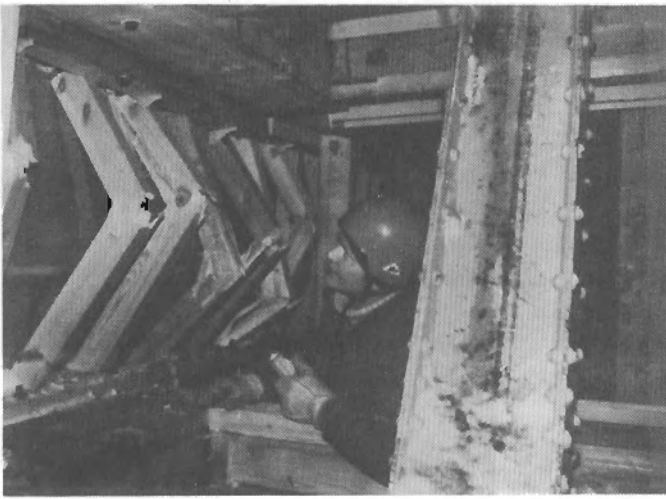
Failed wall studs of the truss enclosure (photo by E. Hodgkins, ADC).
